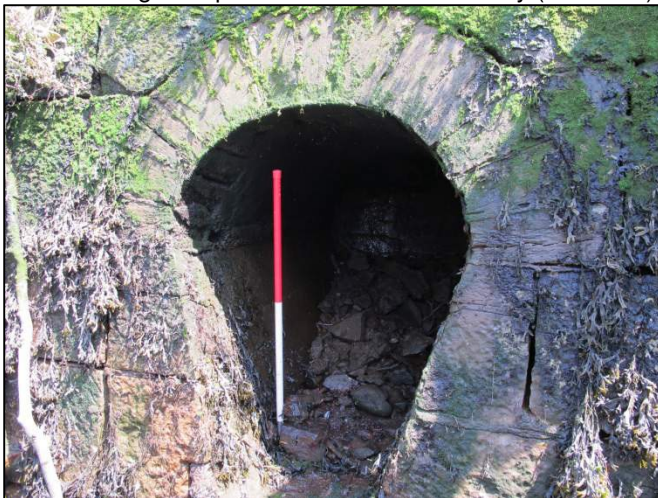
South-facing detail view of the arch-ring from the culvert located on Union Quay (1m scale).
